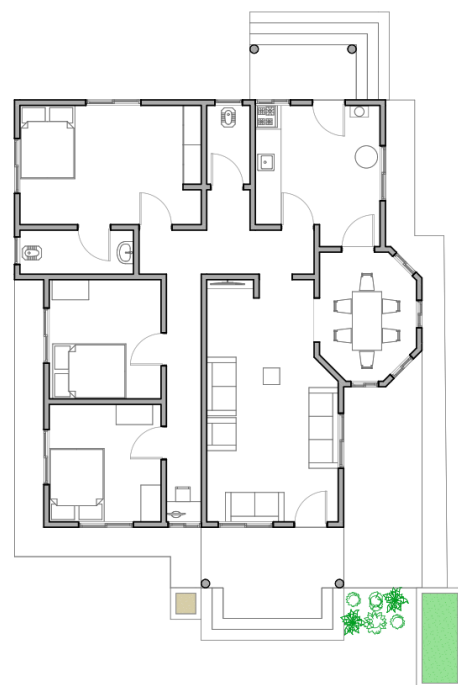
A secondary school teacher has built this modern bungalow house and now lives here with his family after previously renting a house in Makangara village while working in Mkwajuni village. This house is located in Mkwajuni village, Korogwe district, Tanga, Tanzania
